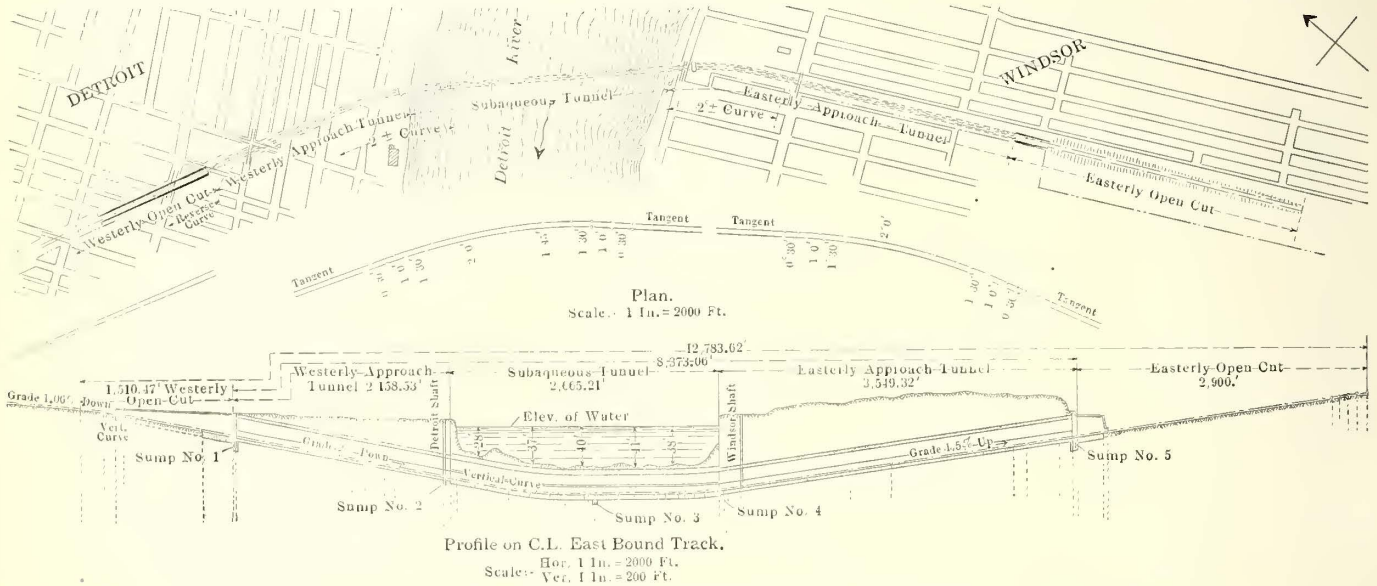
Detroit Tunnel—Plan of Tunnel and Approaches, with Profile of Eastbound Track
